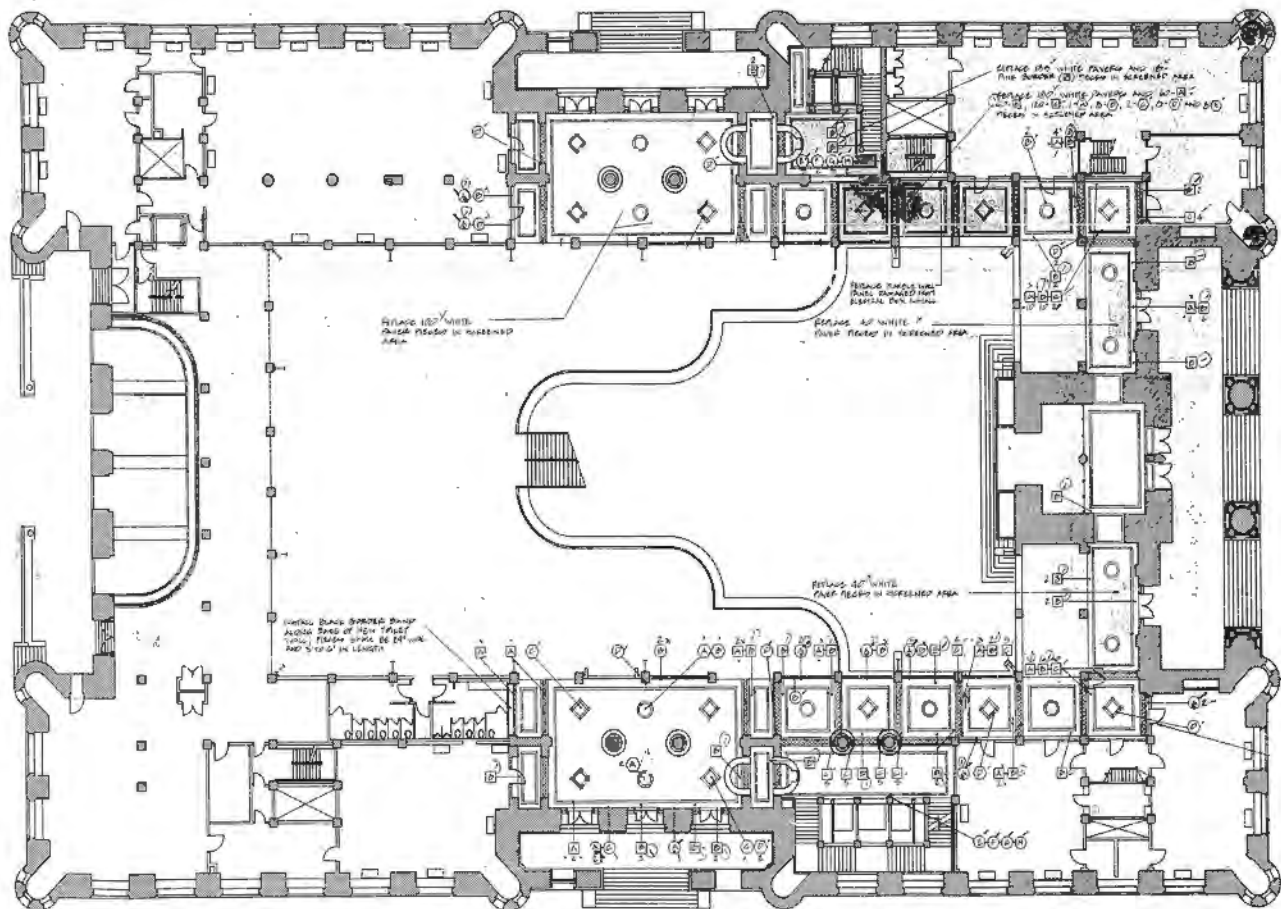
First Floor Plan as Proposed in 1979. Image Courtesy of GSA-NCR Technical Resource Center.
